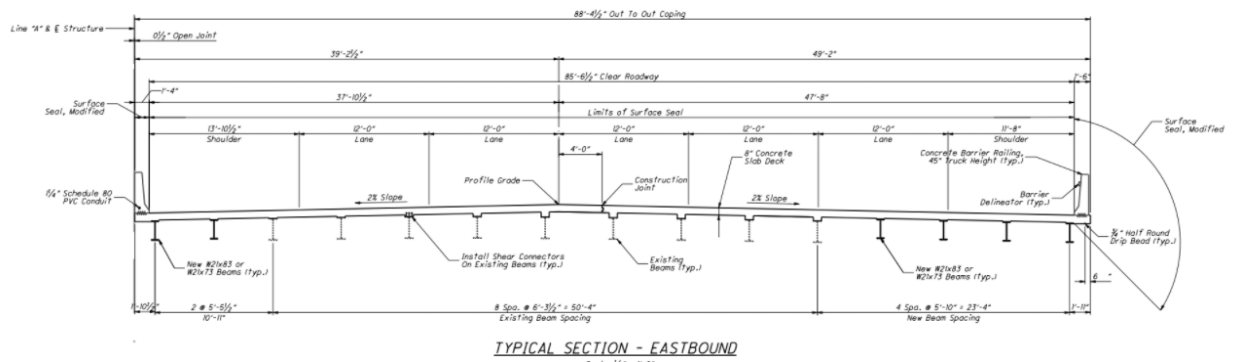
Typical Section of the Bridge (NBI 50340) (2009)
